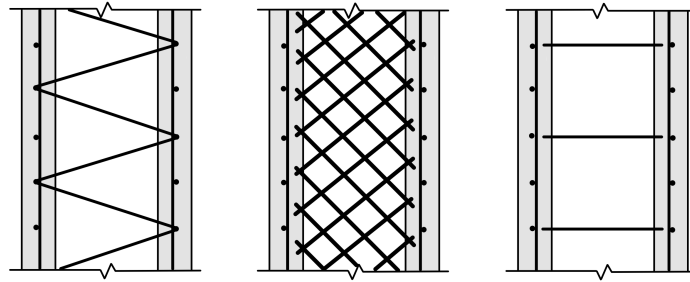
Illustration of precast concrete sandwich wall panel with truss-shaped shear connectors. Based on (Huang et al., 2020).
